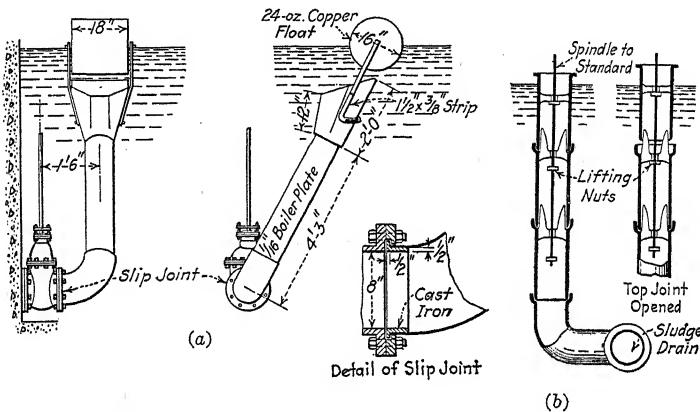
Equipment for unwatering flat-bottomed tanks.
